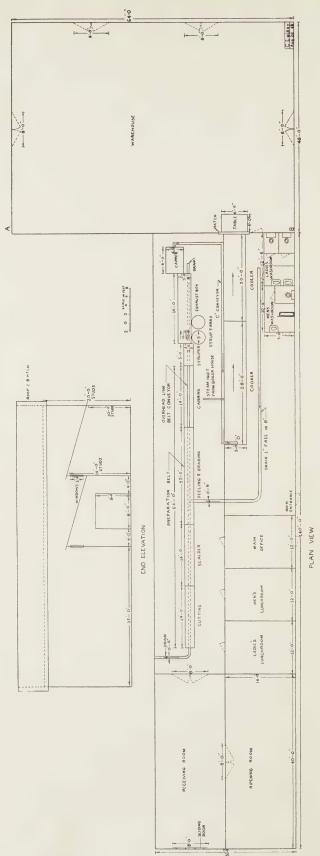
Floor Plan and Elevation of No. 3 Cannery
